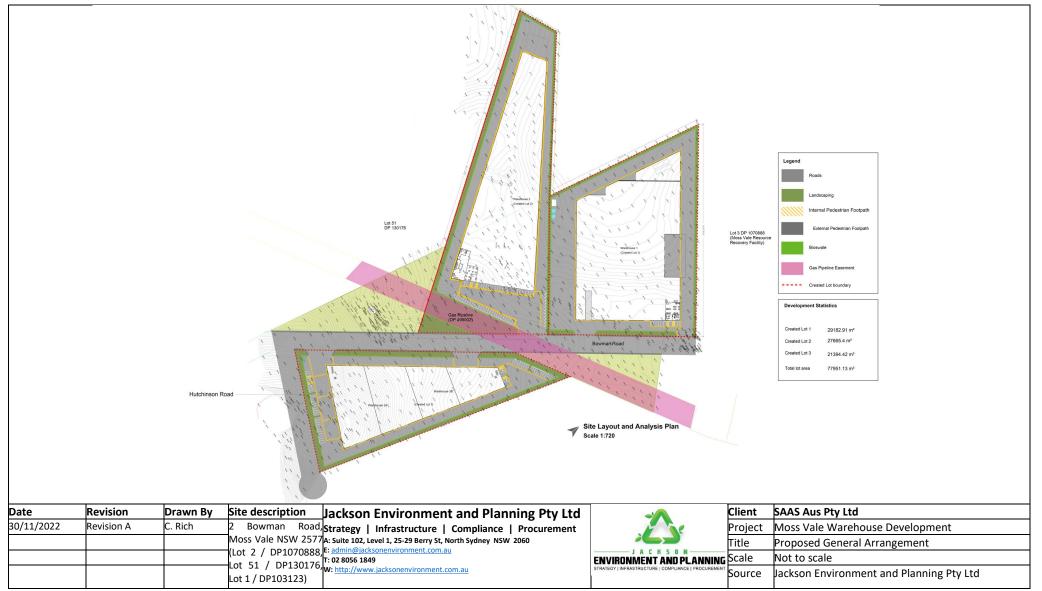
Proposed general arrangement for the industrial subdivision and warehouse development. High resolution plans are contained in Appendix 1.
